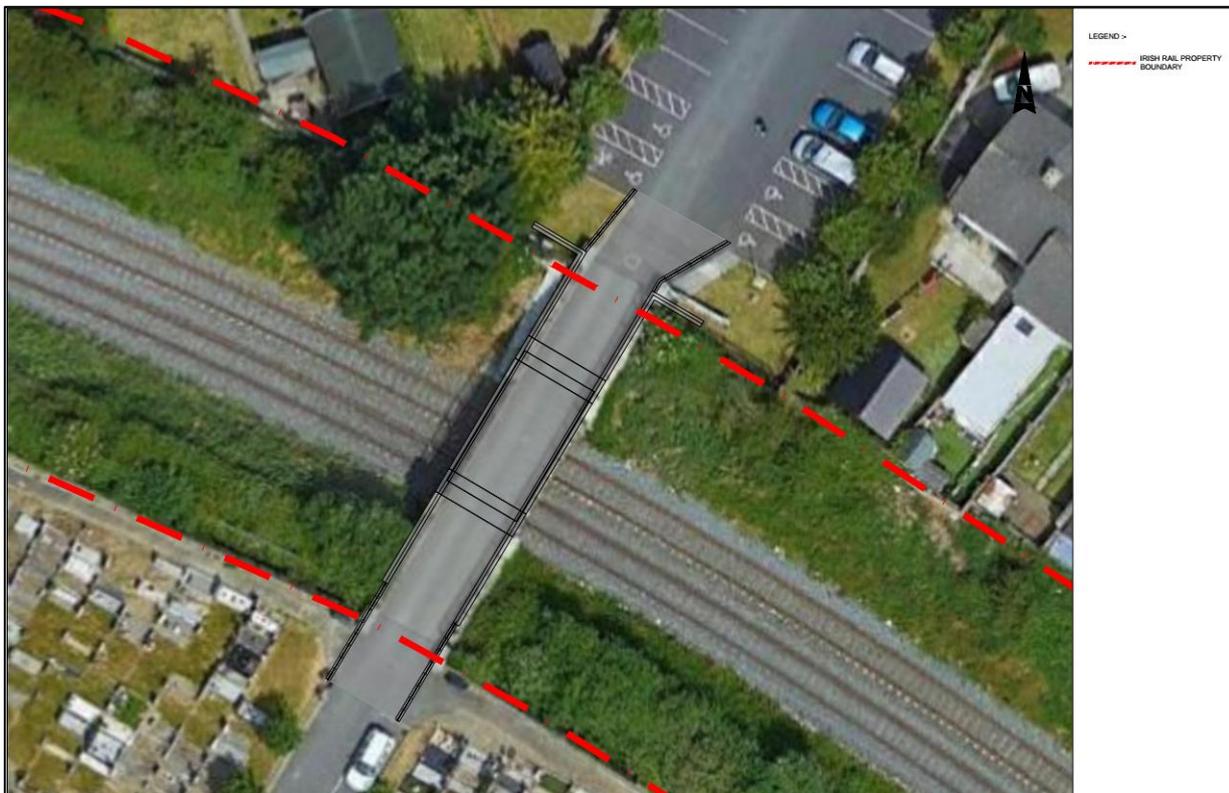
Glasnevin Cemetery Bridge (OBO10) General Arrangement
